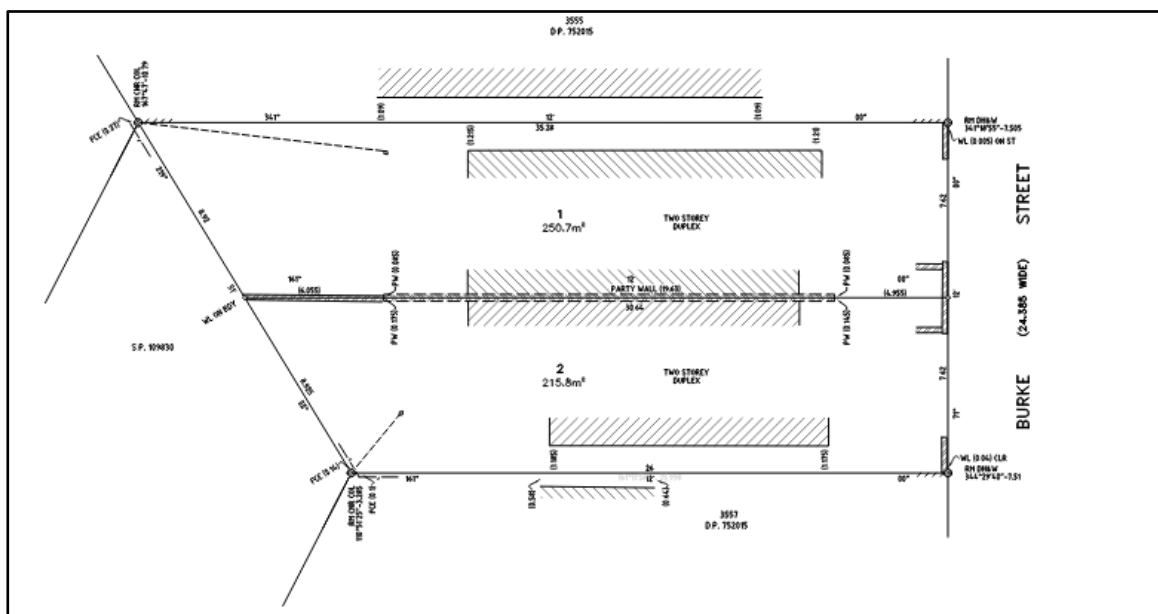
Extracted from Plan of Subdivision (Source: ISMAT HABBOUCHI)
